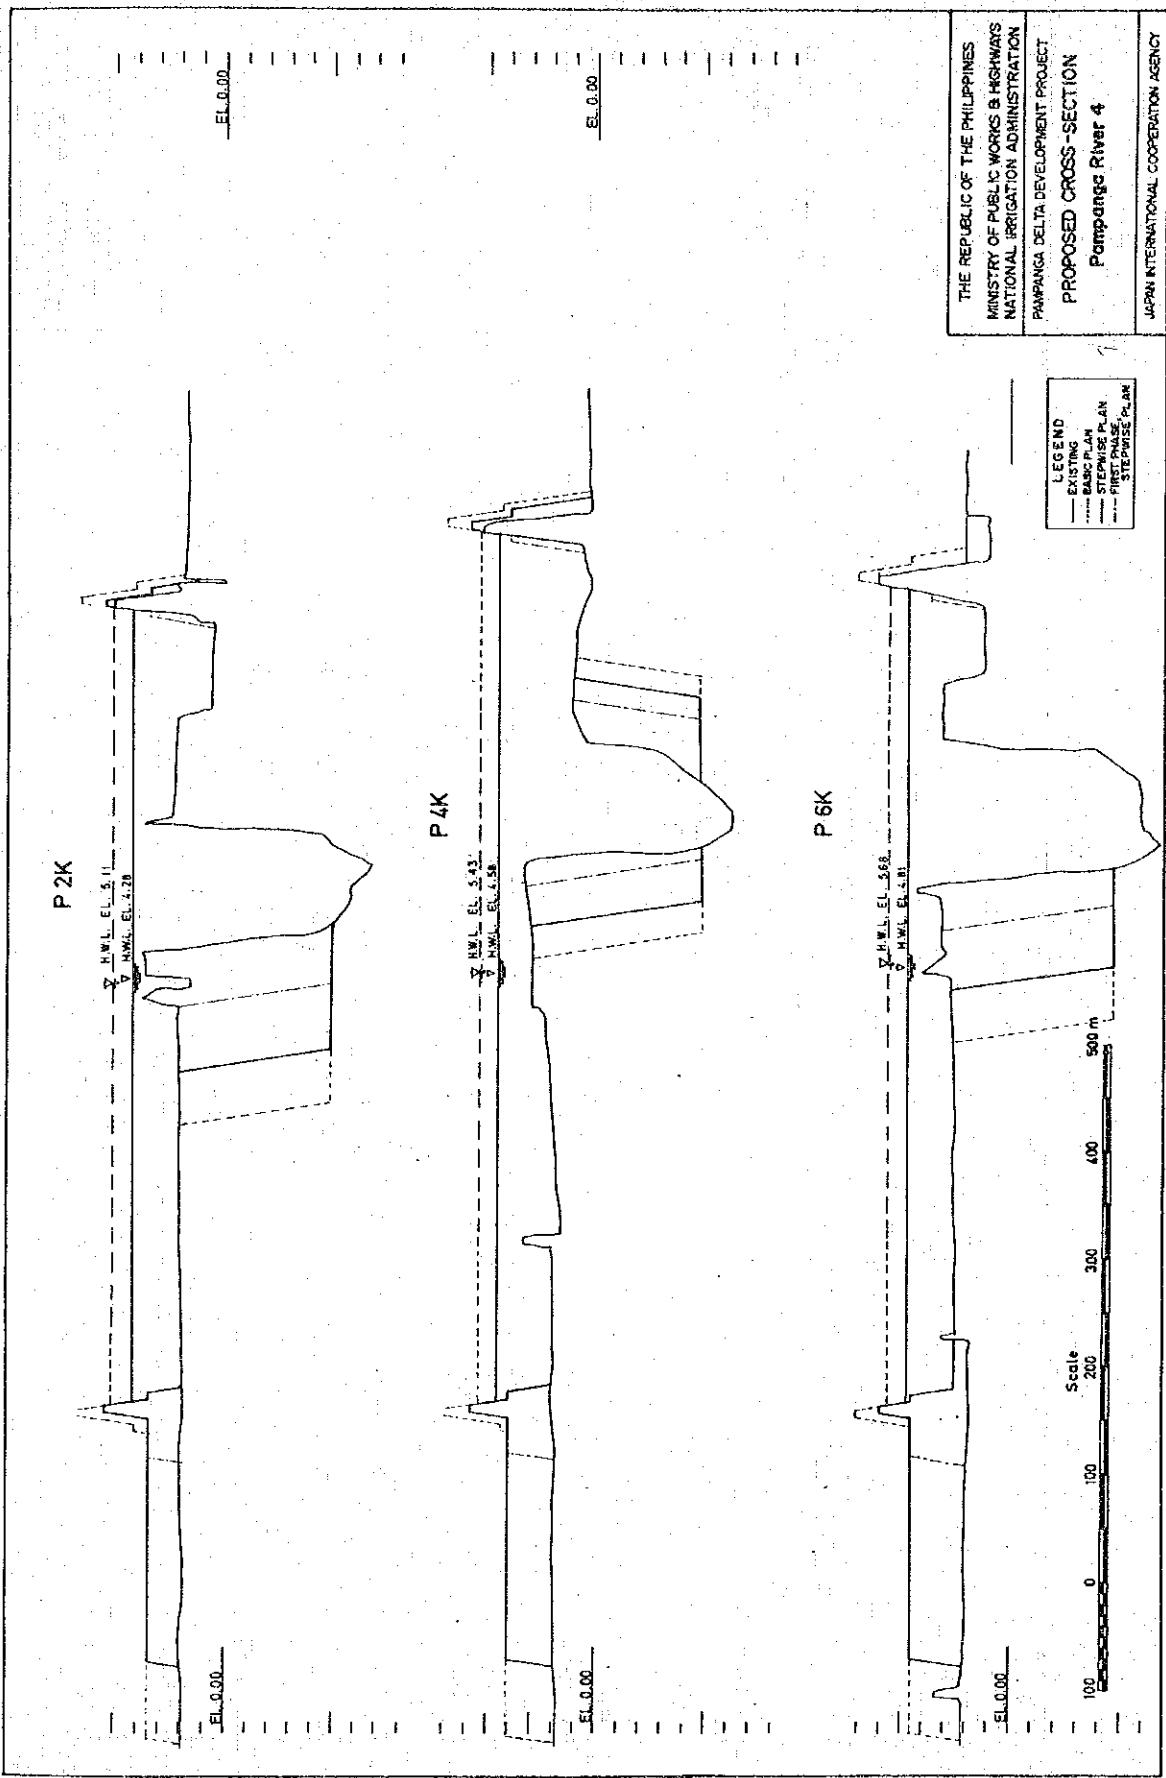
(5) PROPOSED CHANNEL CROSS-SECTION
